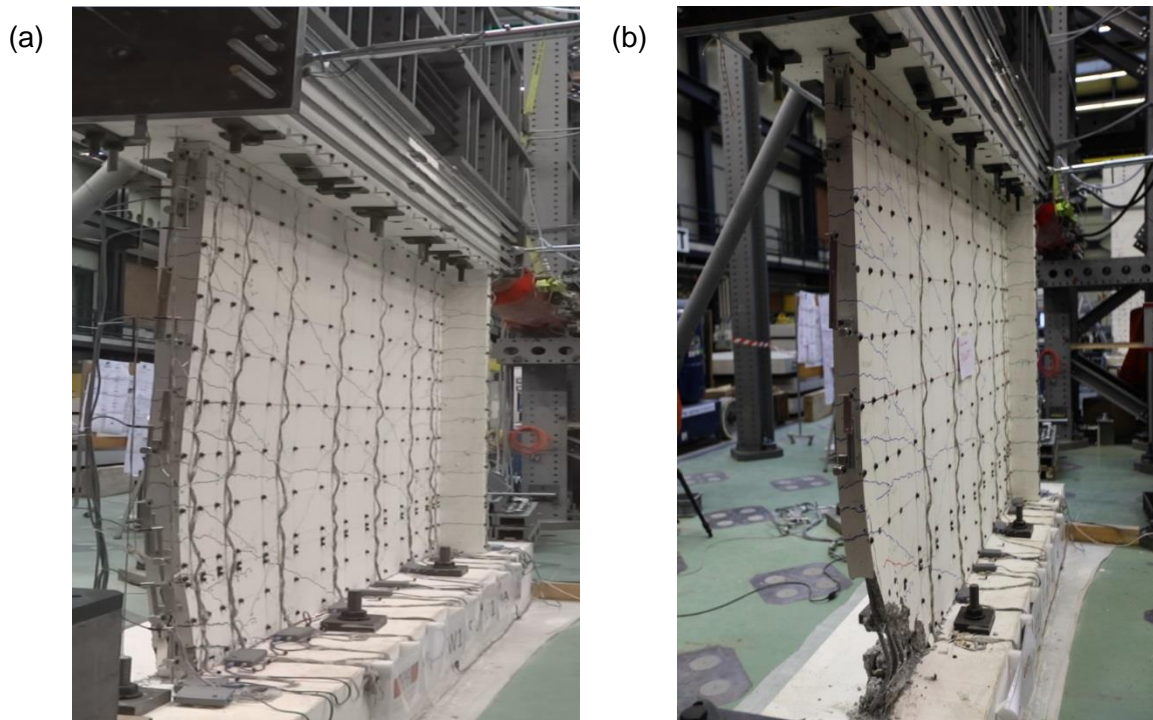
(a) Deformed shape of the wall at loading LS30→LS31 (around 0% in-plane drift);
